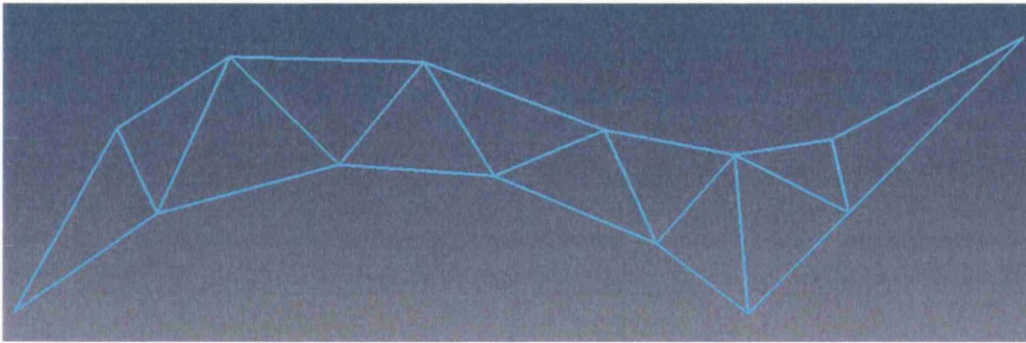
Plan view of 22m x 1D Space Frame showing 14 members around perimeter and 11 bracing members (rigid elements omitted)
